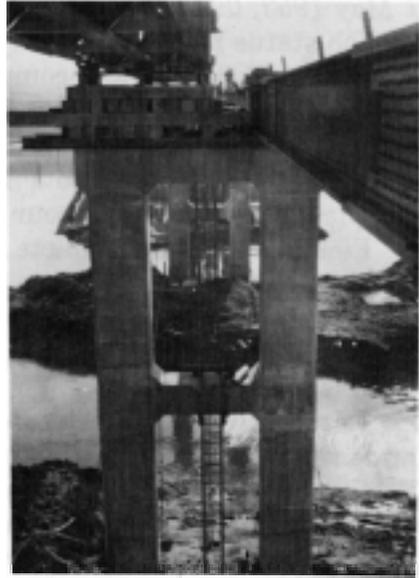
View showing cribbing used in launching upstream girder from the west abutment to pier 7.
